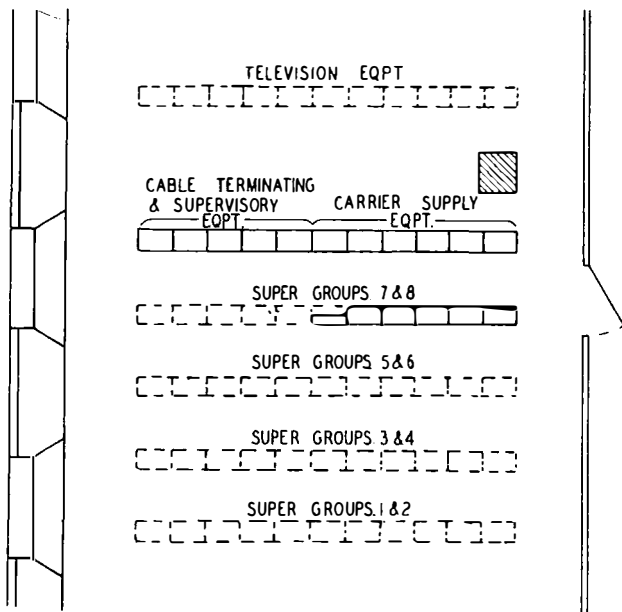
RACK LAYOUT, LONDON TERMINAL STATION.
